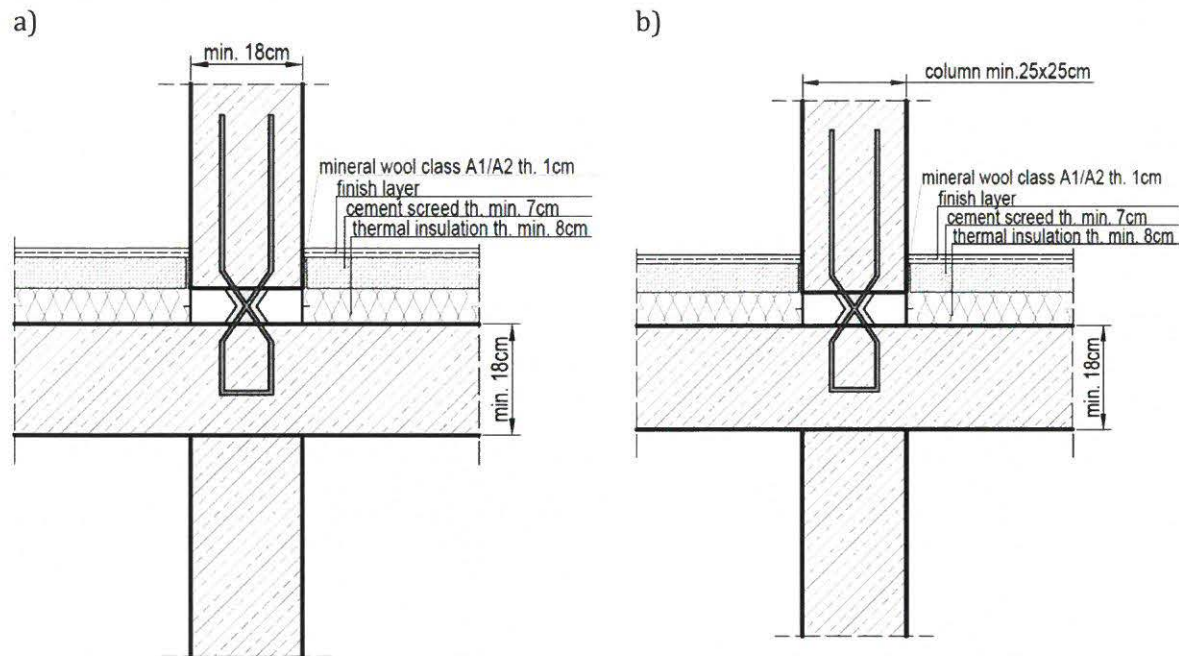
Joint without fire protection, with thicker layer of cement screed and thermal insulation, and with sealing made of stone mineral wool with Schöck Alphadock / Sconnex Typ W
